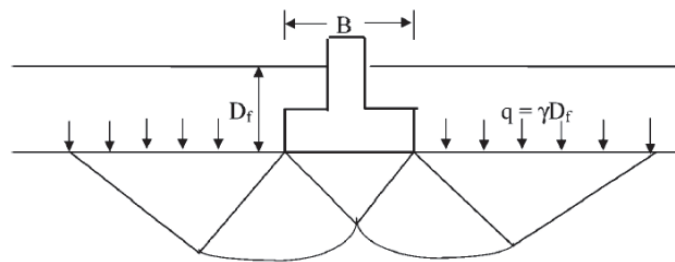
the failure mechanism of soil's bearing capacity beneath a rough, rigid continuous foundation when exposed to a vertical central load, proposed by Terzaghi (1943)
